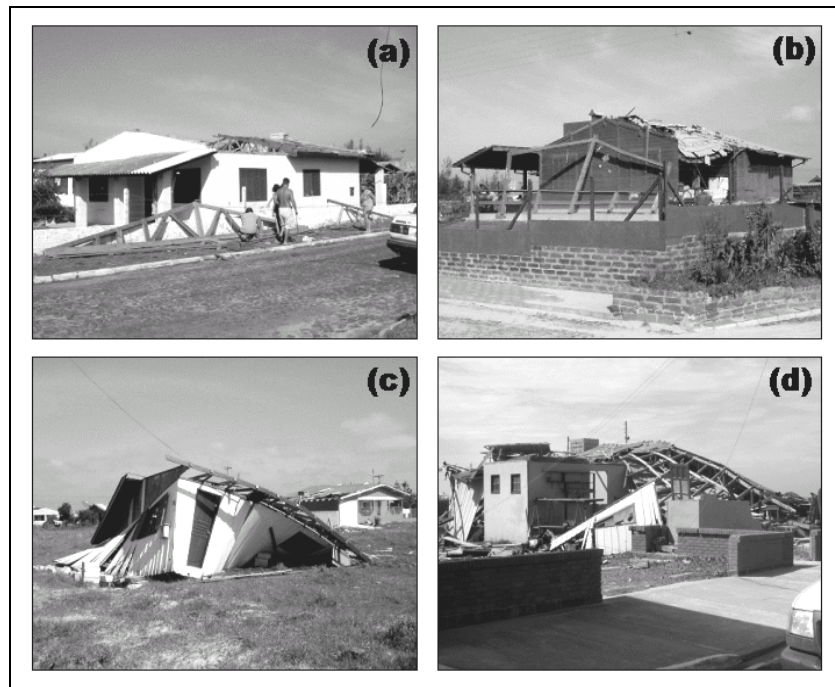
Types of damages caused by wind on residences in Passos de Torres (SC): (a) total roof failure; (b) partial roof failure of a wood frame house; (c) total destruction of a wood frame house; and (d) total collapse of a masonry house.
